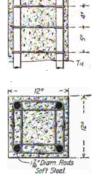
shows the general arrangement of reinforced concrete piling employed to support the wall columns for the tenstorey steel-framed addition to the Hallenbeck Building at Park and Pearl Streets, New York.<sup>1</sup>
